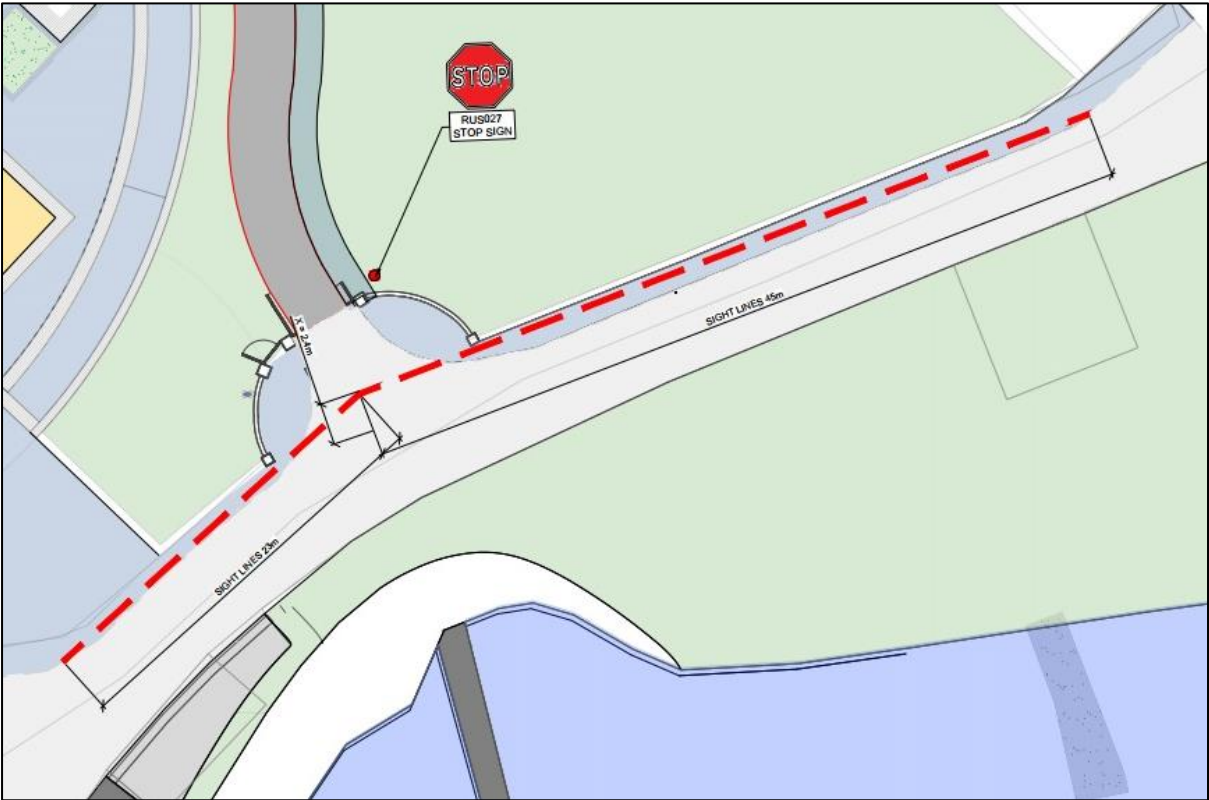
Proposed Visitor Centre Entrance Junction Layout Plan
